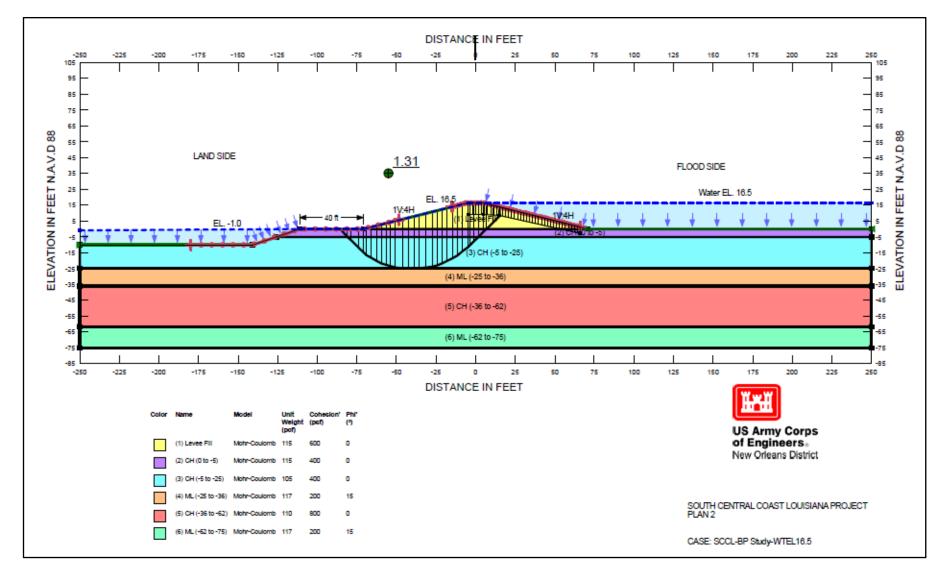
Plan 2 Levees – Slope Stability Analysis for Water at Construction Grade.
